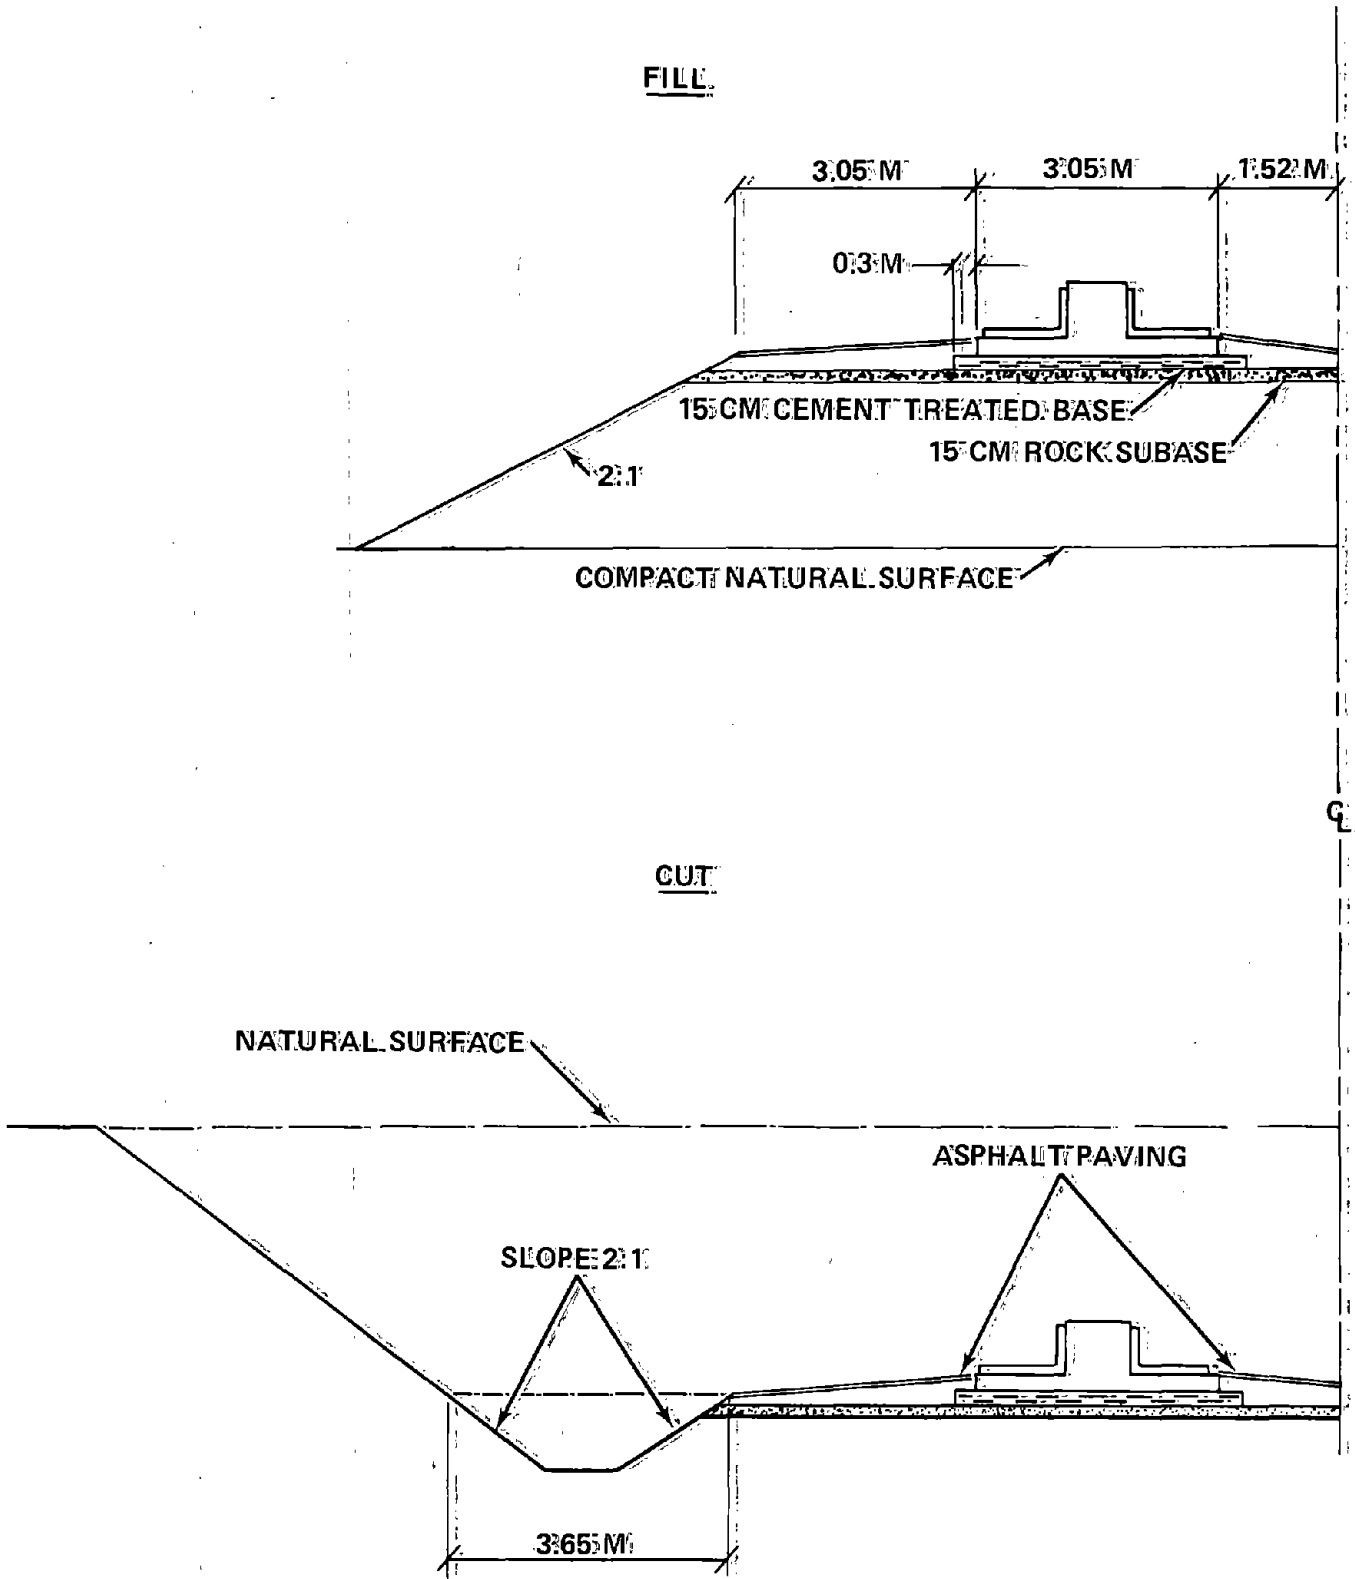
TYPICAL AT-GRADE GUIDEWAY CROSS SECTIONS
